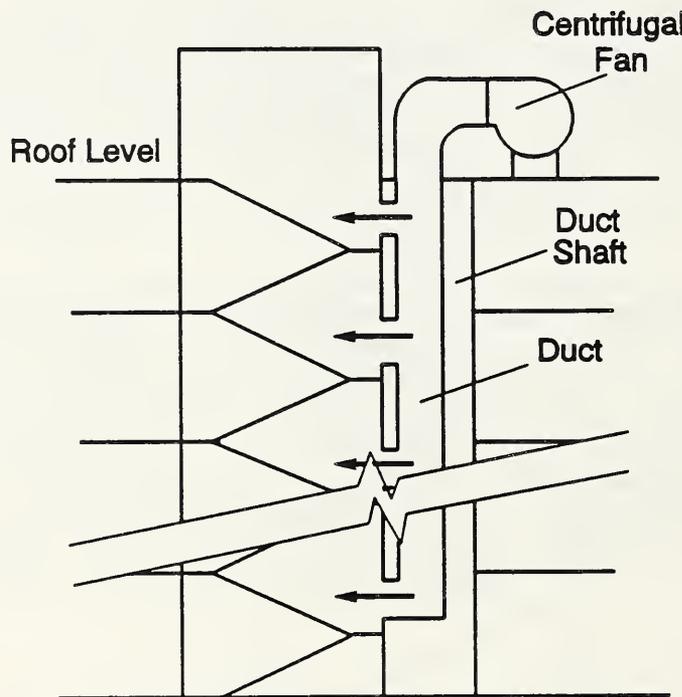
Stairwell pressurization by multiple injection with roof mounted fan
